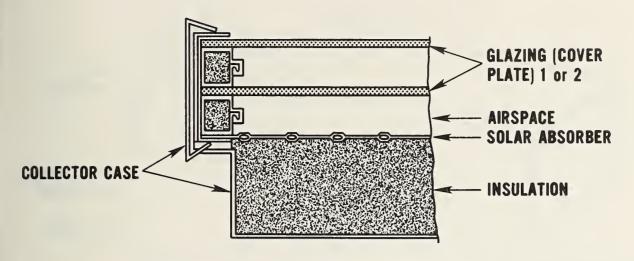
Cross Section of Typical Flat Plate Solar Collector
